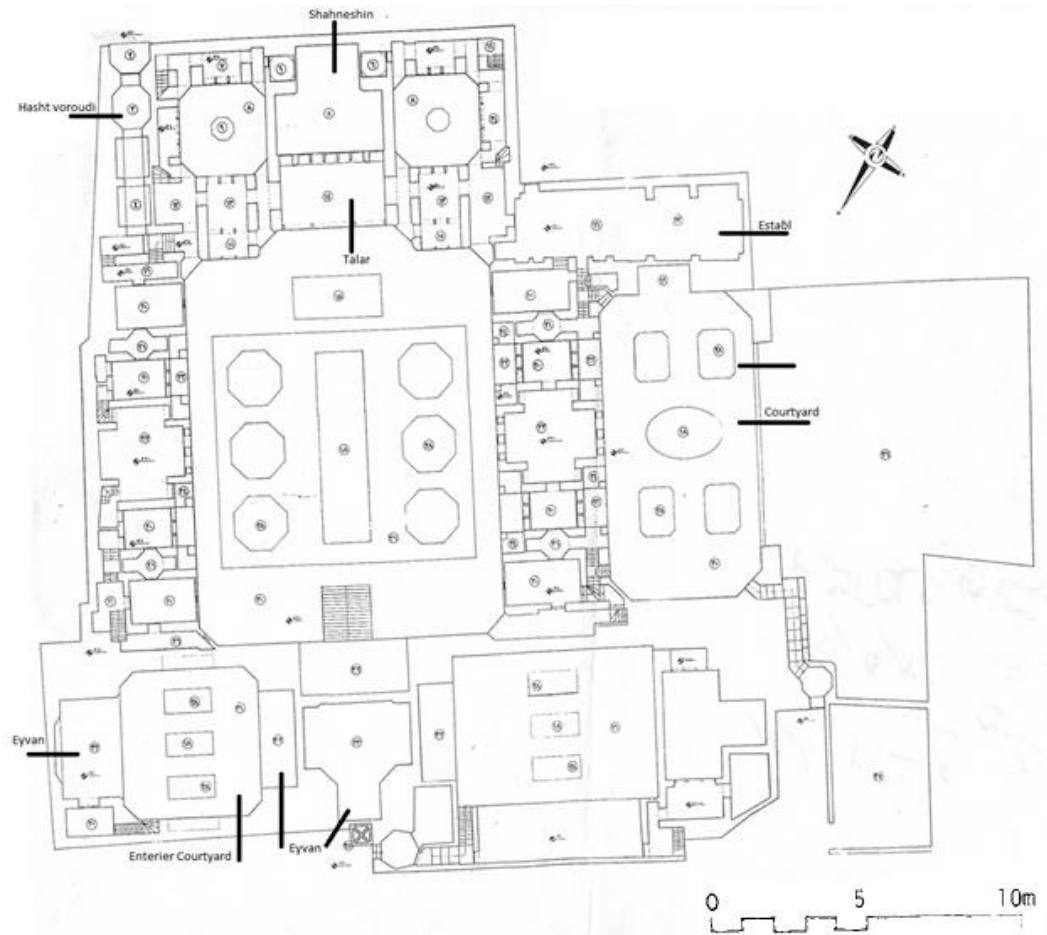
Tabatabaee House (First Floor Plan) Kashan (URL 16)
